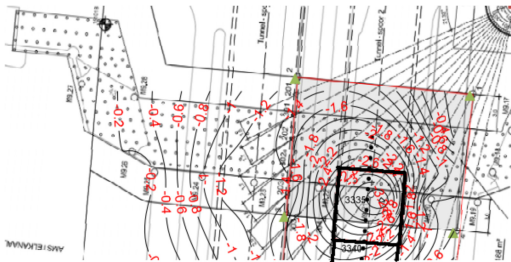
Settlement contours at surface level of southern bridge abutment in front of the tunnel face.
